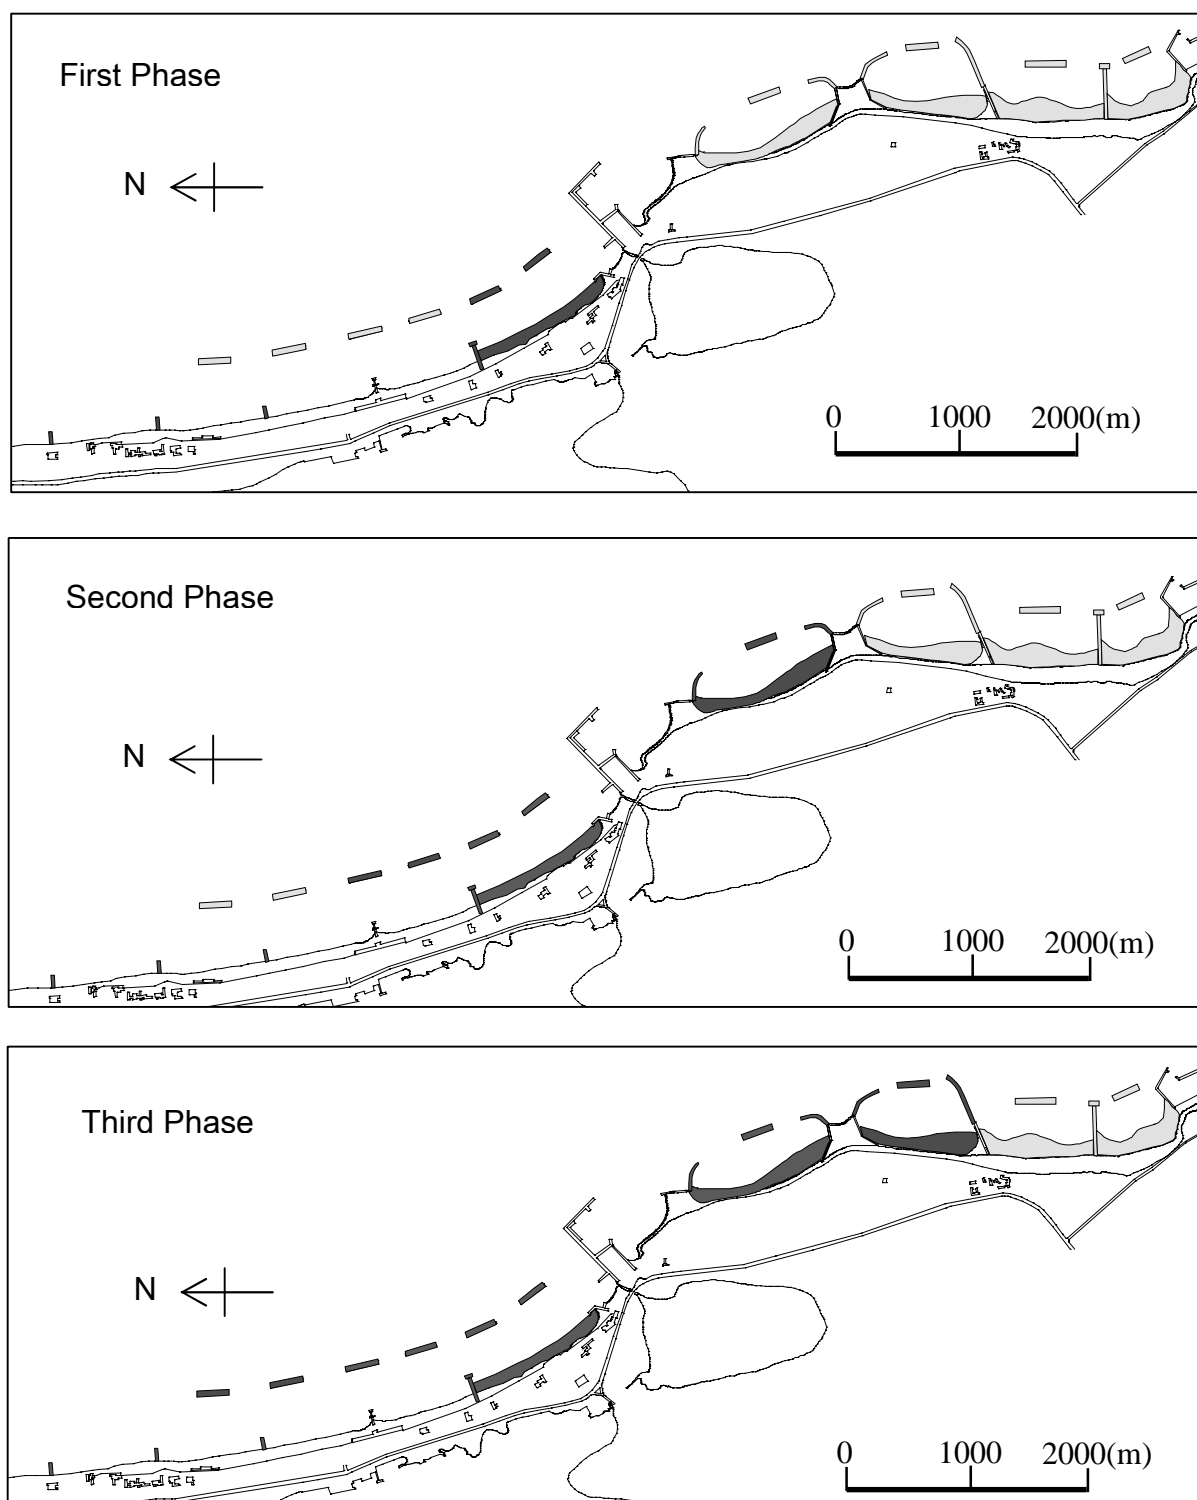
Phase-wise plans for facility installation in Mamaia and Tomis sub-sectors
